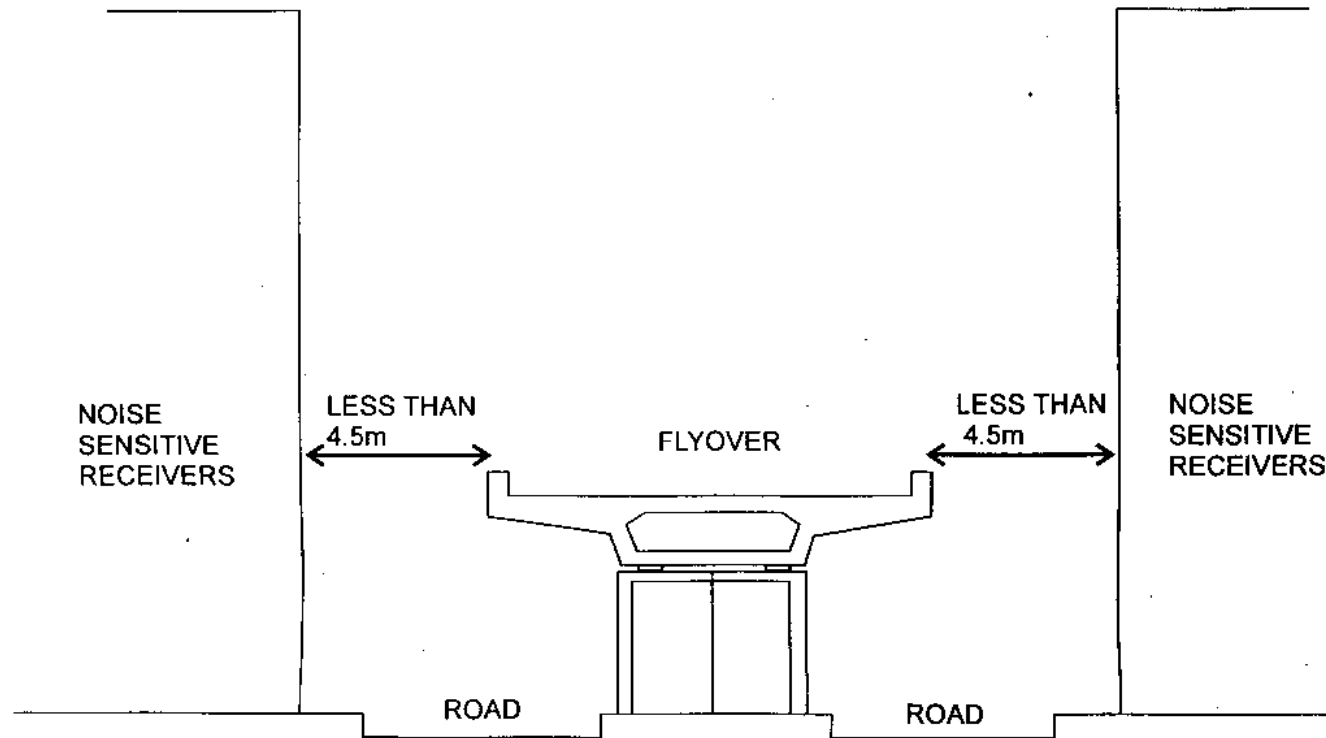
TYPICAL ROAD - RECEIVER CONFIGURATION (EXAMPLE THREE)
